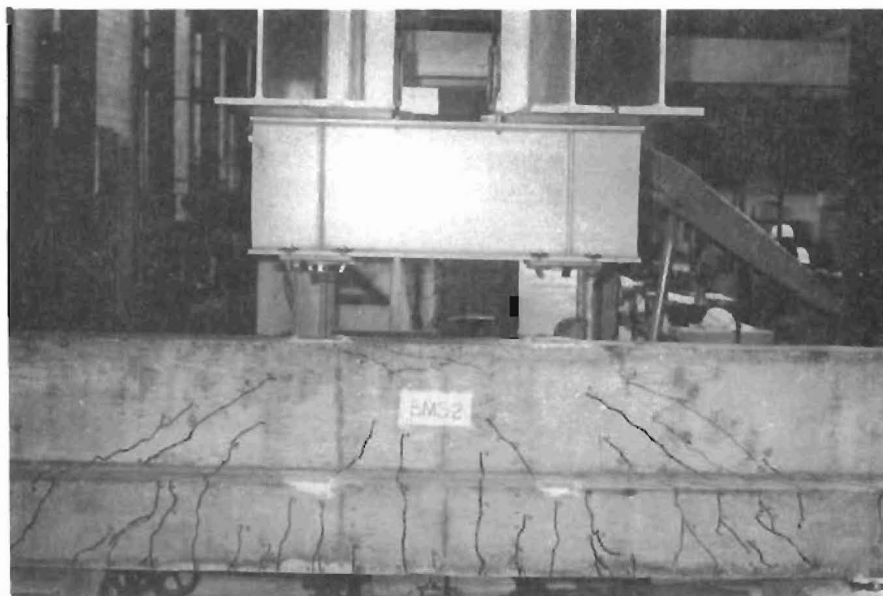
Cracking pattern and extent of cracking in specimen EMS2
